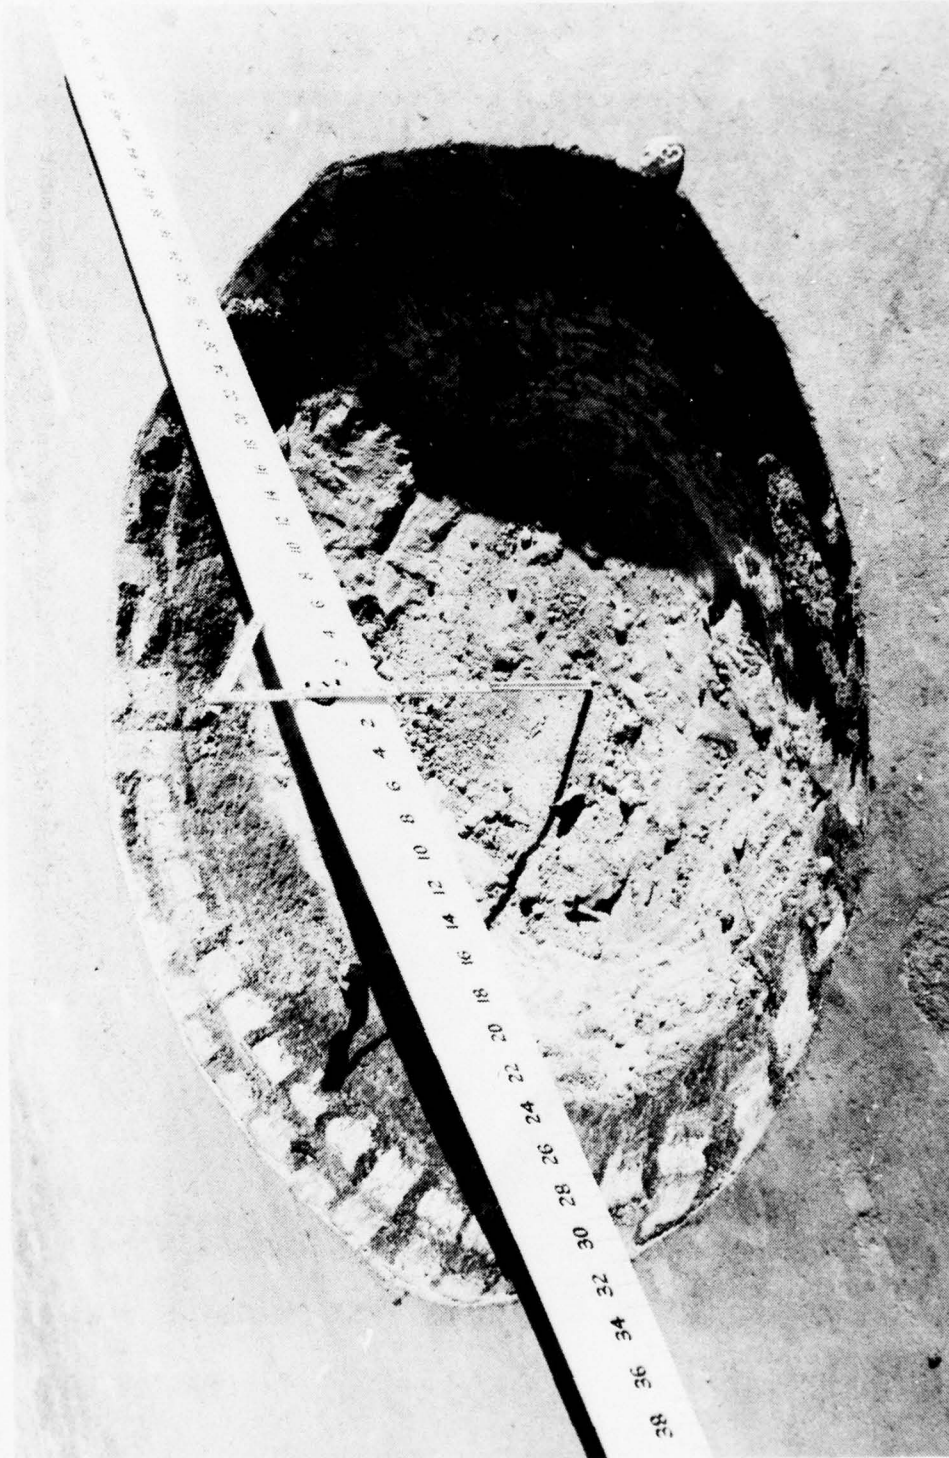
Typical 5-Foot-Diameter Area in Flexible Pavement
